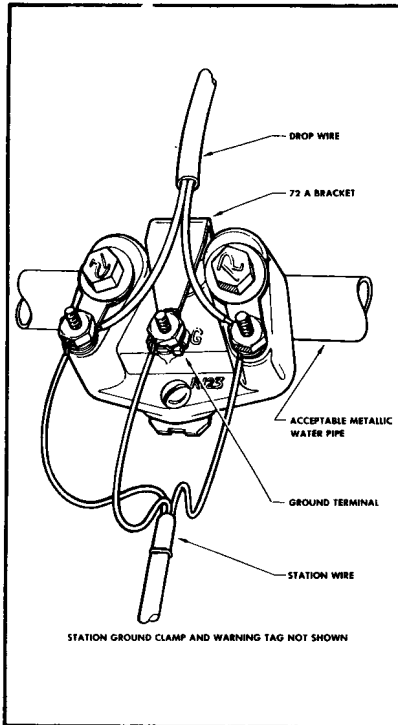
123 Type Protector Installed on a Metallic Water Pipe (for Indoor Use Only)
